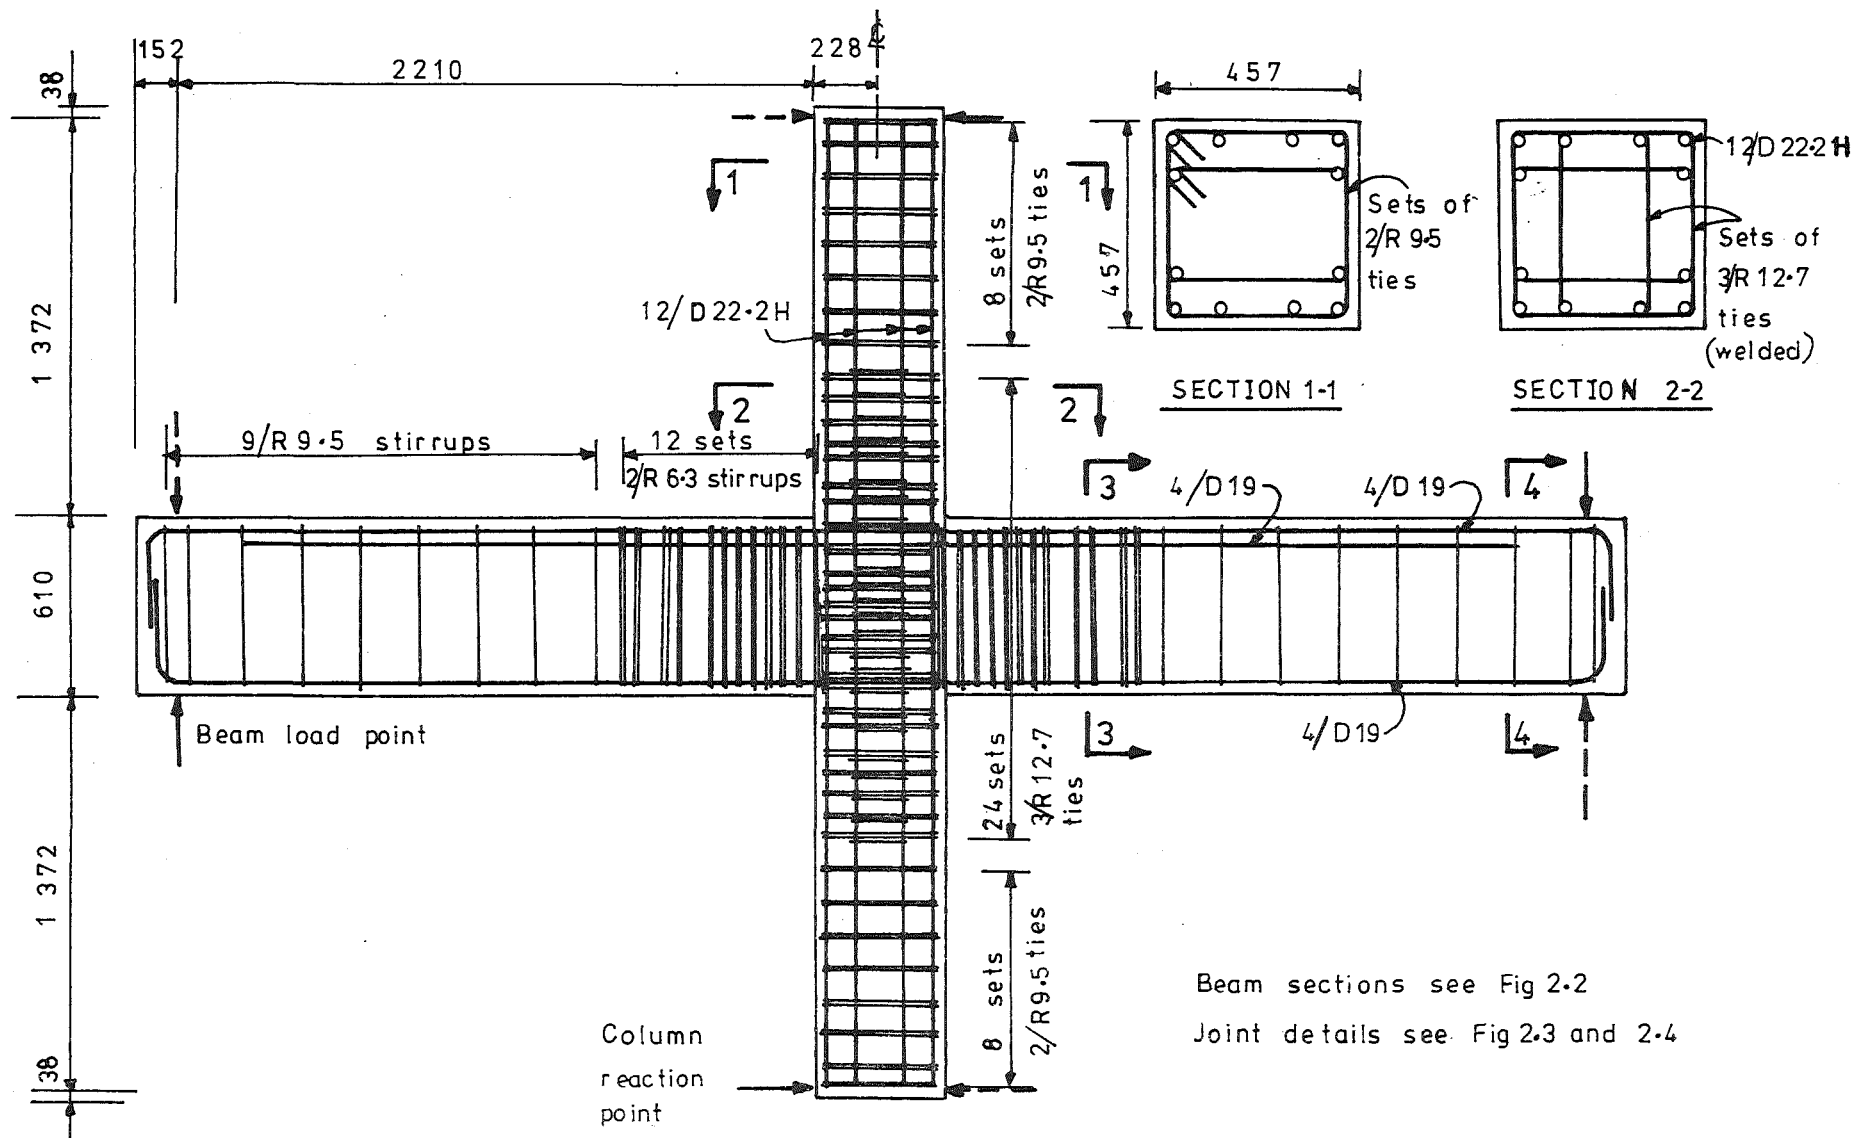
TEST UNIT REINFORCING UNIT B 11
